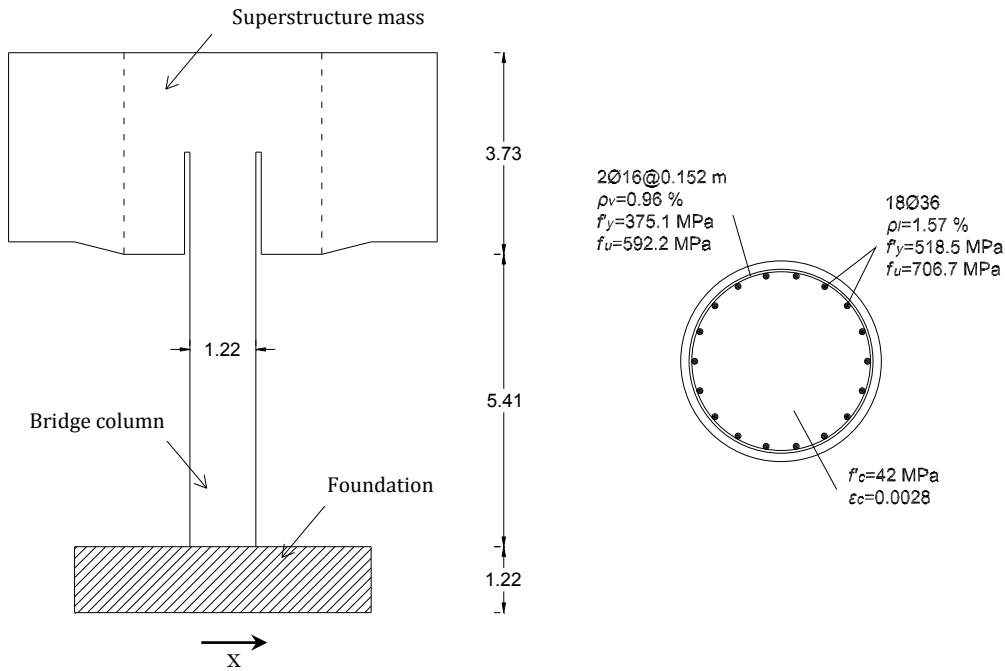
Structure 1: Elevation view (left) and cross-section details (right)
